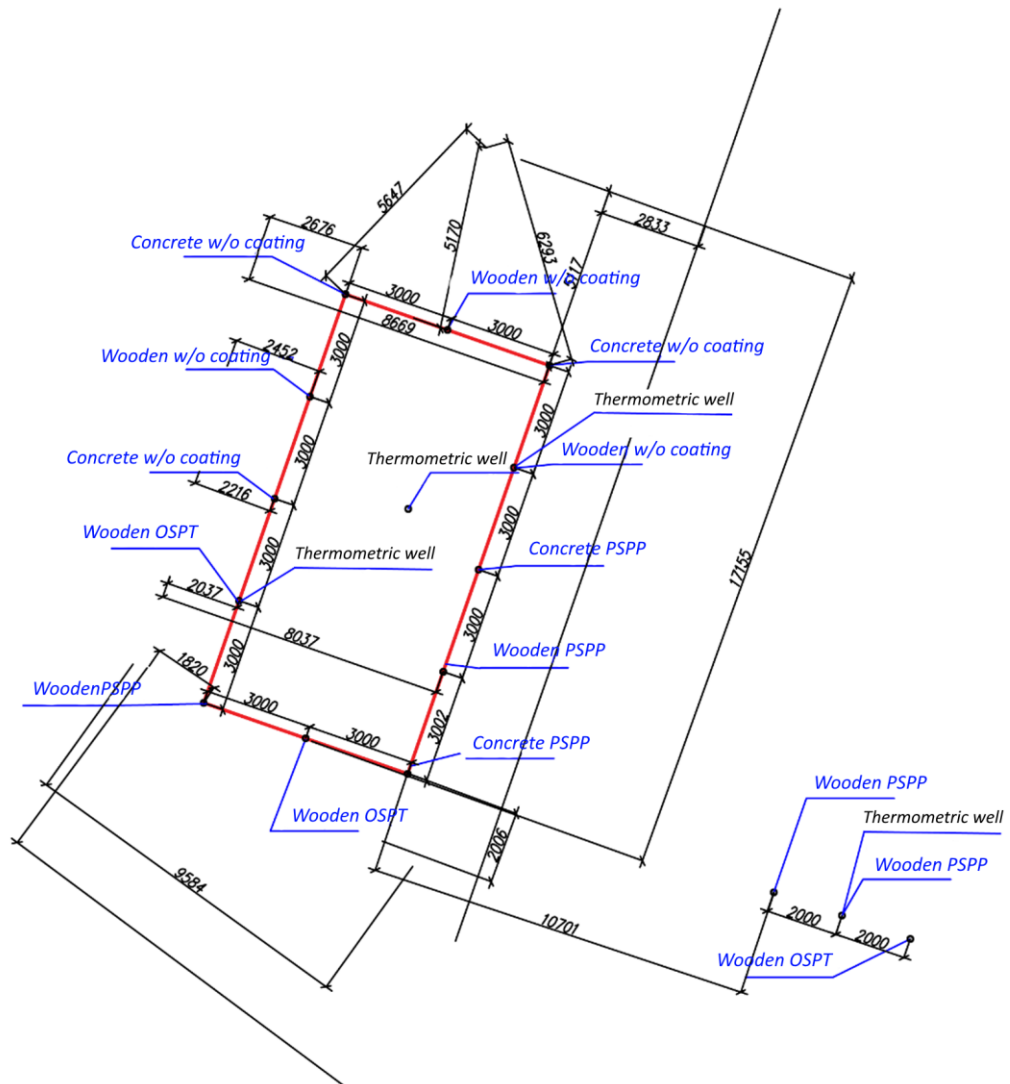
Layout of the samples of line supports foundations (footings) at the site of field tests.
